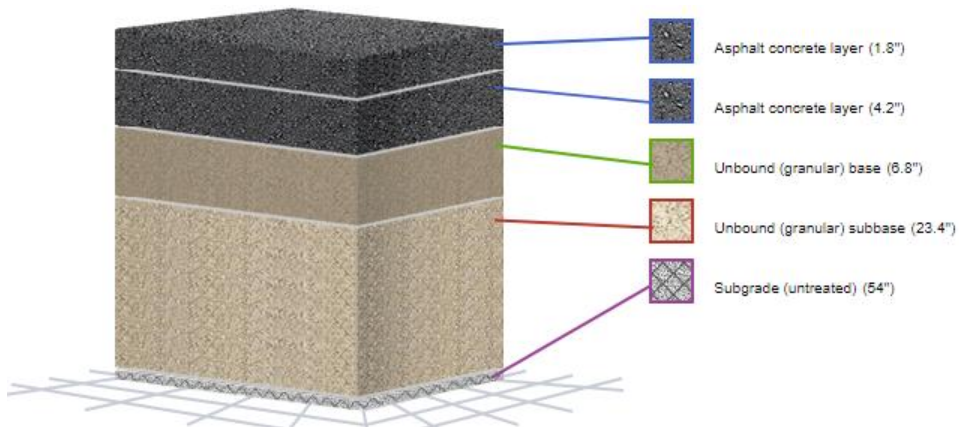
Pavement Structure for NJ-1030 Section (Source:InfoPave).
